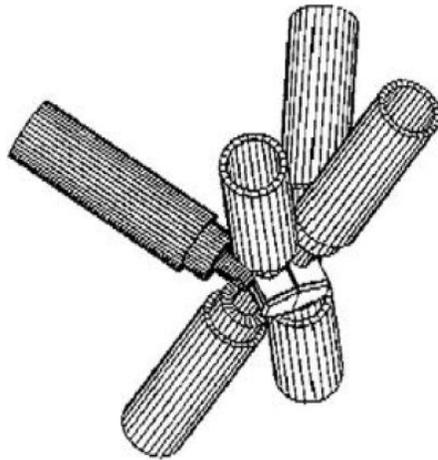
Glued-Wood Fitting with Steel Plates, Welded Connection
